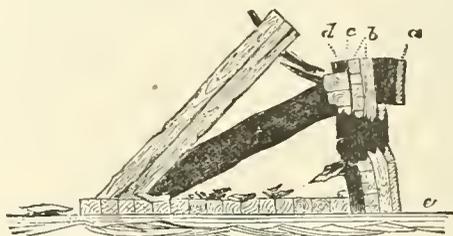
Section of "Warrior" Target, showing the hole made by the 600-pound Shell, and displacement of the upper plate, a, armor plating, 4½ in. thick (displaced); b, teak backing, 18 in. thick; c, boiler plate skip, ¾ in. thick; d, wrought-iron beams; e, platform.
